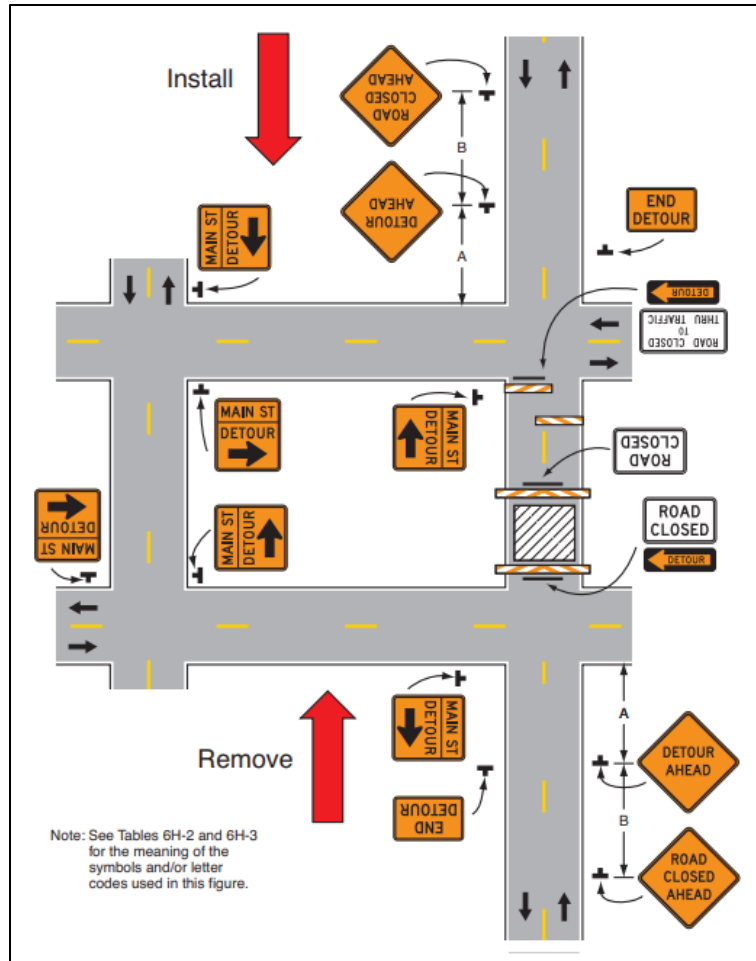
Detour sign installation and removal (ATSSA, 2008)
